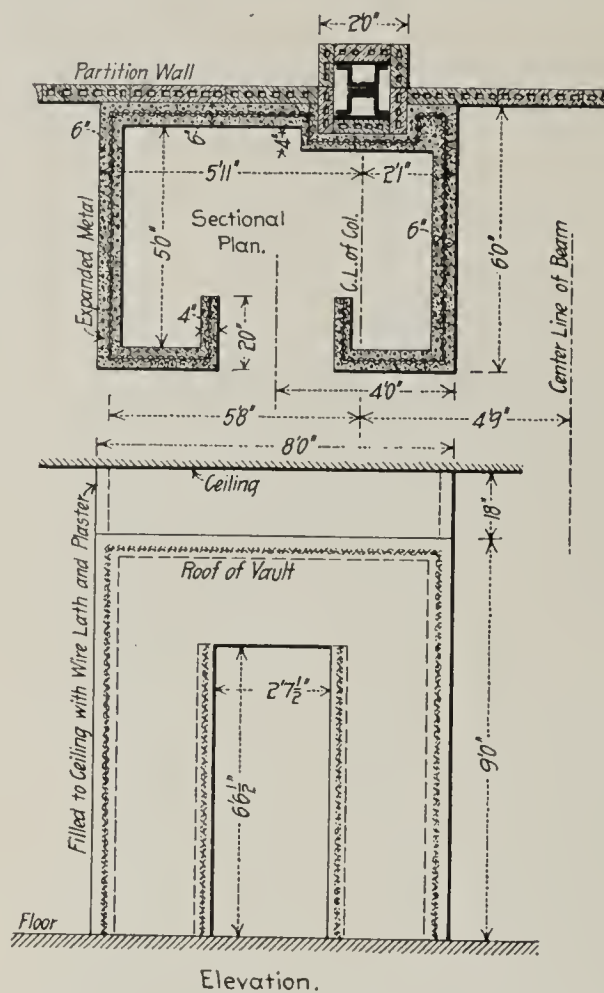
Plan and Elevation of Fireproof Vault of Concrete and Expanded Metal.
